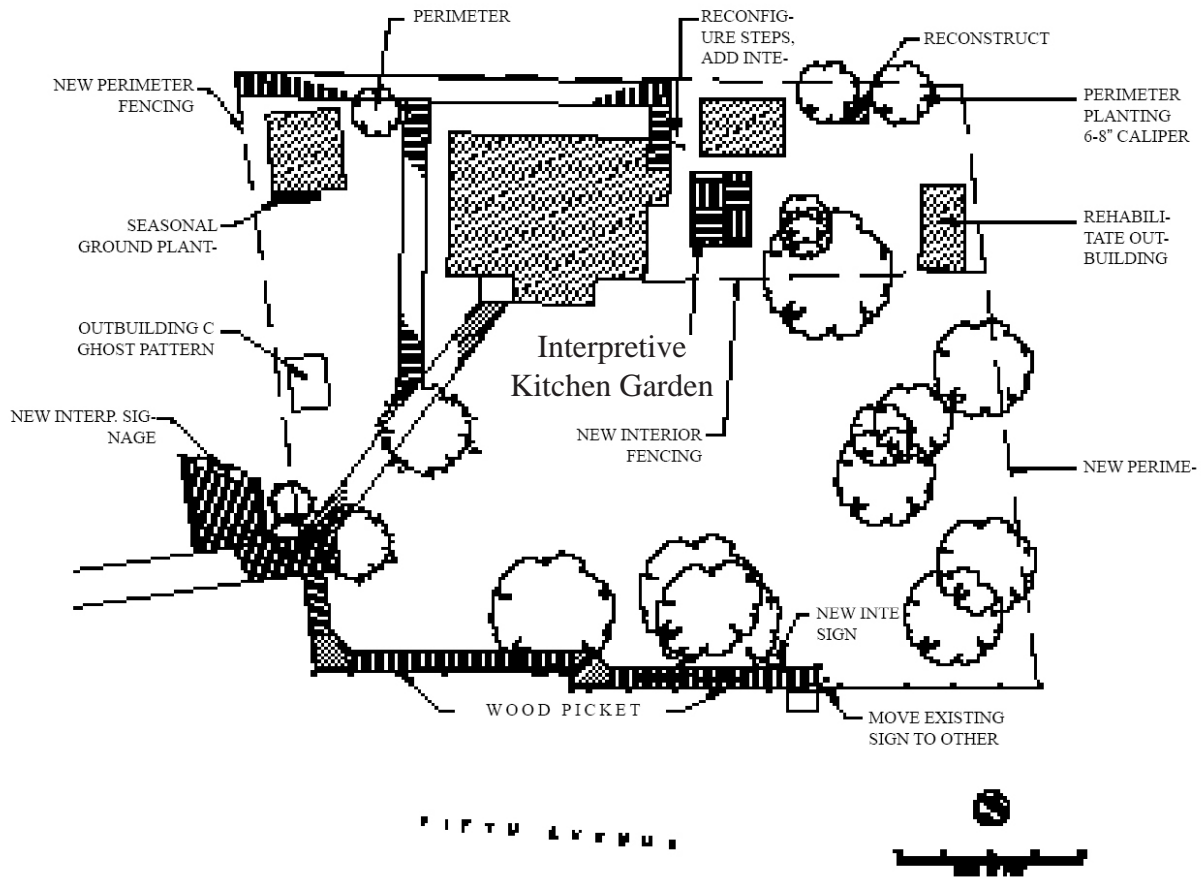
Moore House Plan showing location of proposed kitchen garden
